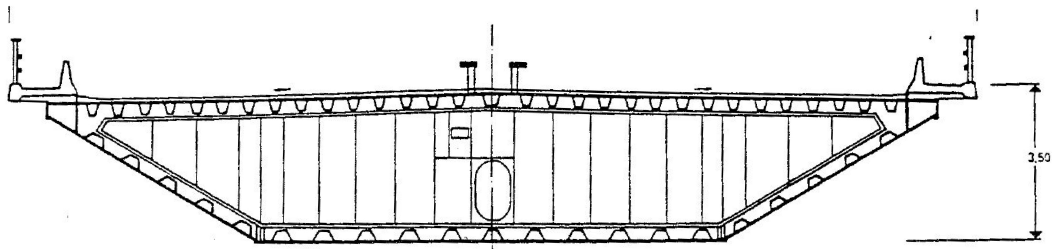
Steel deck section of Faro Bridge in Denmark [2].
